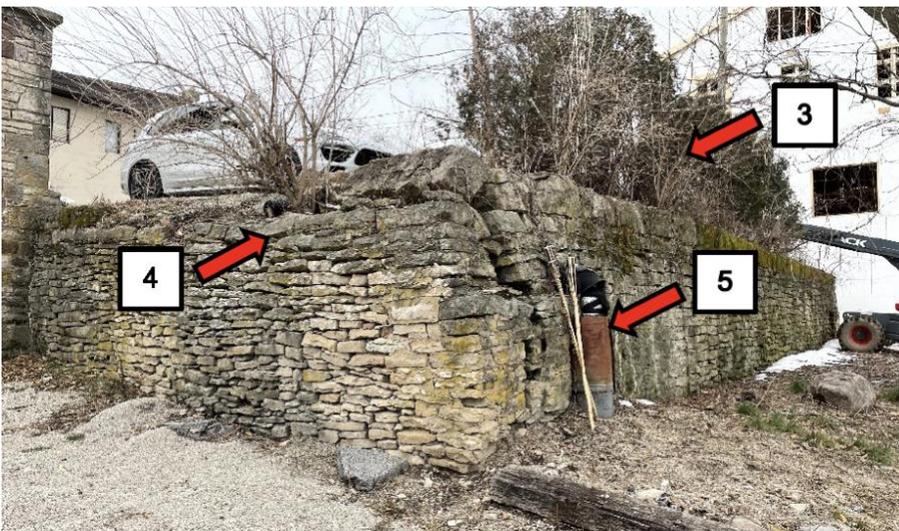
View of retaining wall, looking northwest at the southeast corner (Kooi, Bernie. *Overall view of wall*. 2021. 40 North High Street, Korda/Nemeth Engineering, Inc. 2021, p.1).
